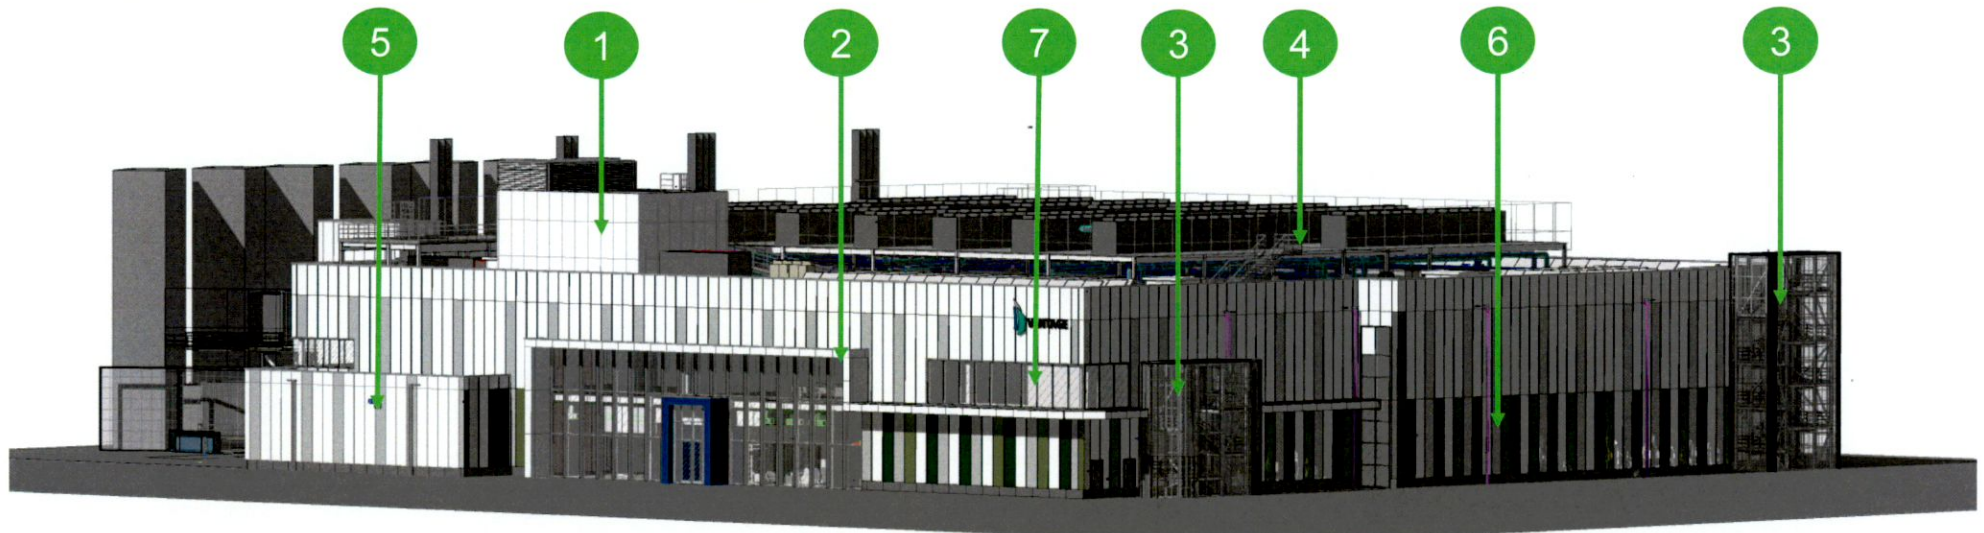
Modified Perspective From Roundabout on New Nangor Road
